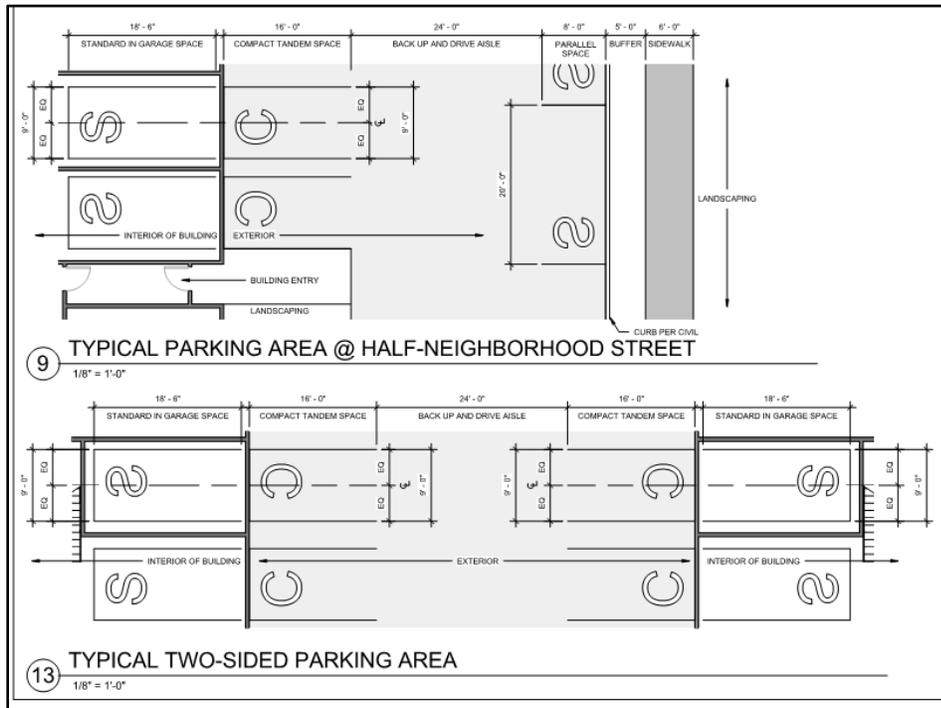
Tandem stall dimensions for parking in the 3-story buildings
